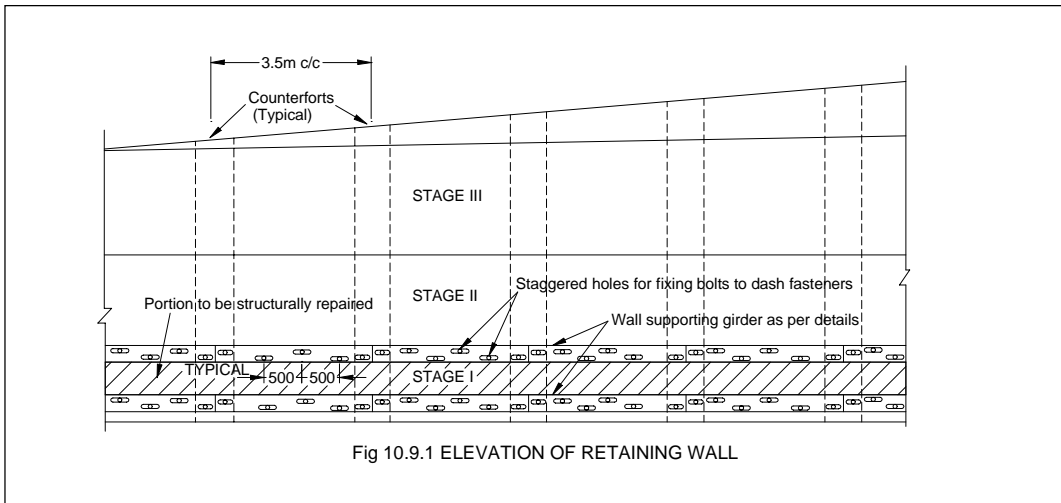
Typical arrangement of counter fort retaining wall
